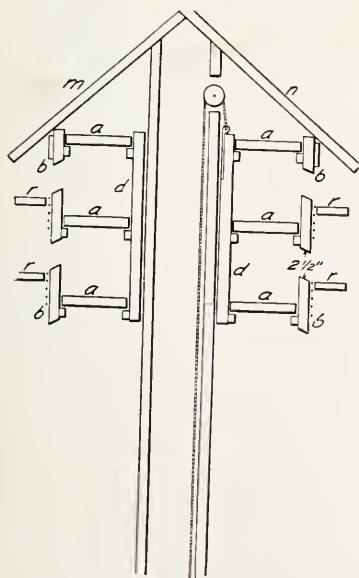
Cross vertical section of martin house; raised and doors open.
